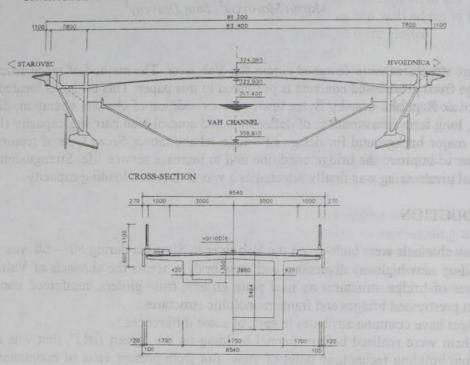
Hvozdnica Bridge. Longitudinal and Cross Section.
